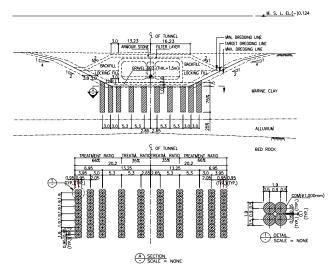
Typical CDM foundation layout at tunnel elements E3 to E14.
